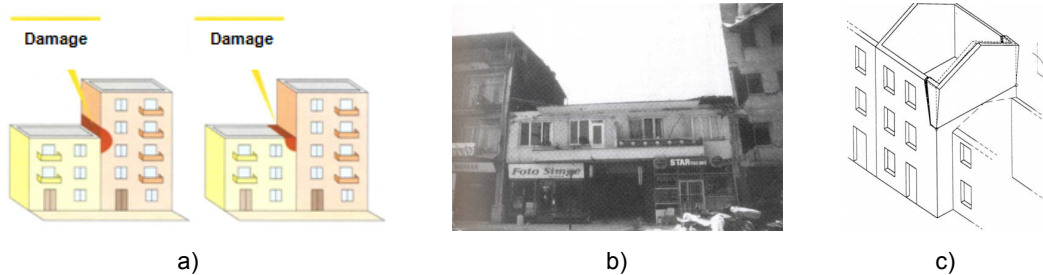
Interaction between buildings with different height: a) Pounding between buildings (Lopes *et al.*, 2008); b) Damage on the lower building caused by the compression applied by the higher buildings. (Lopes *et al.*, 2008); c) Overturning of the side wall consequence of the different height of the buildings inside the compound (Logormasino, 2007).
